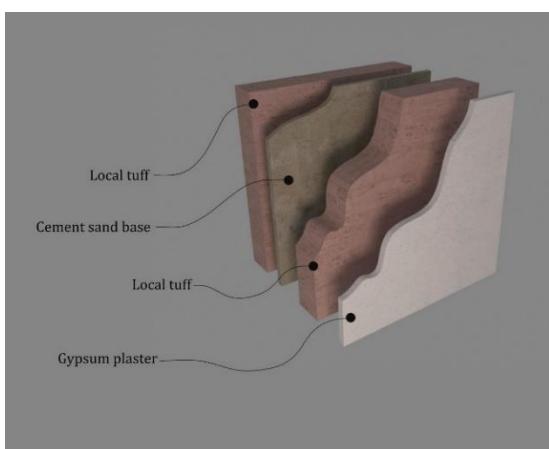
5 floor enclosing structure of a multi-story residential building
